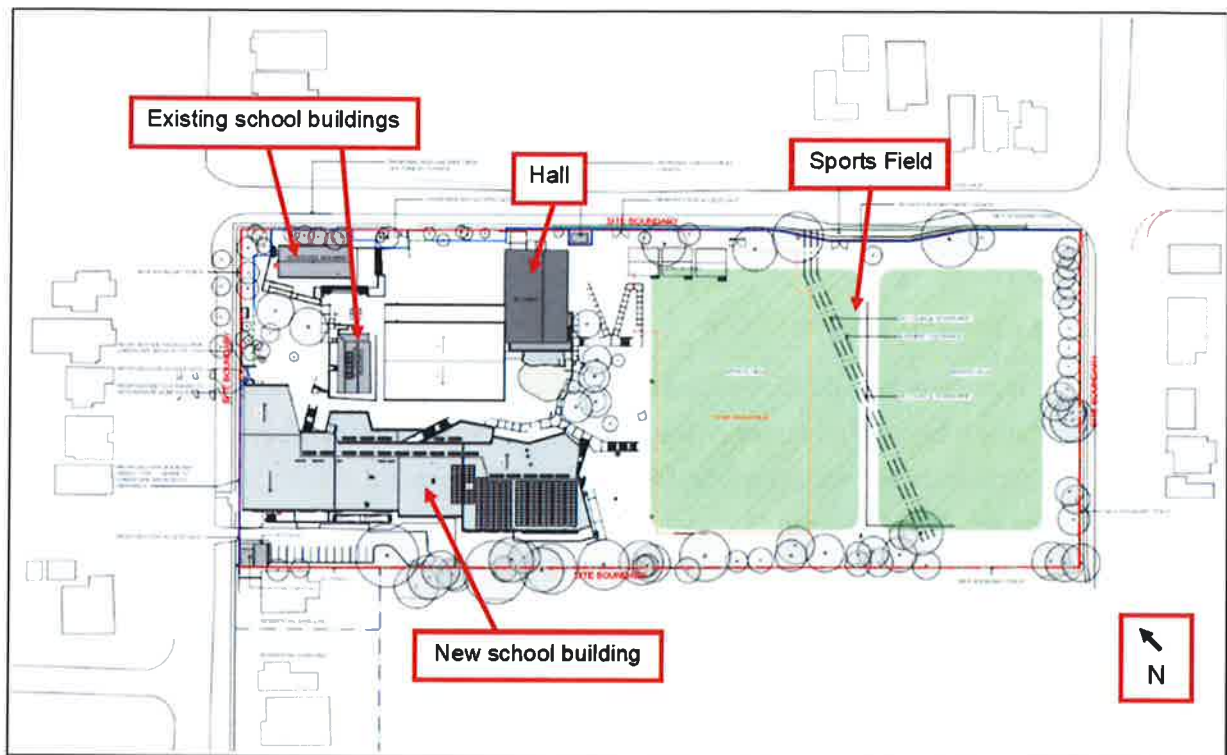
| Approved Site Plan (Base source: Applicant's Modification Application 2019)
